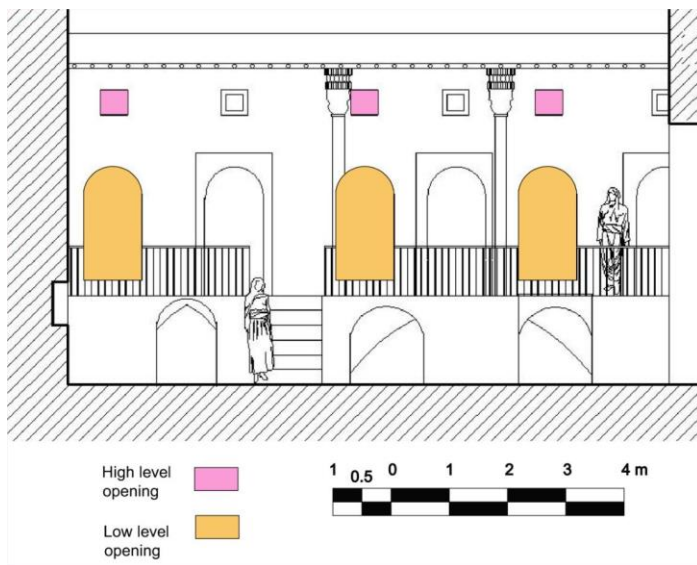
shows a cross-section of vernacular houses in Erbil. The pink shaded areas are ventilation openings located high on the walls of both floors. The yellow shaded areas are low-level ventilation openings [4].
